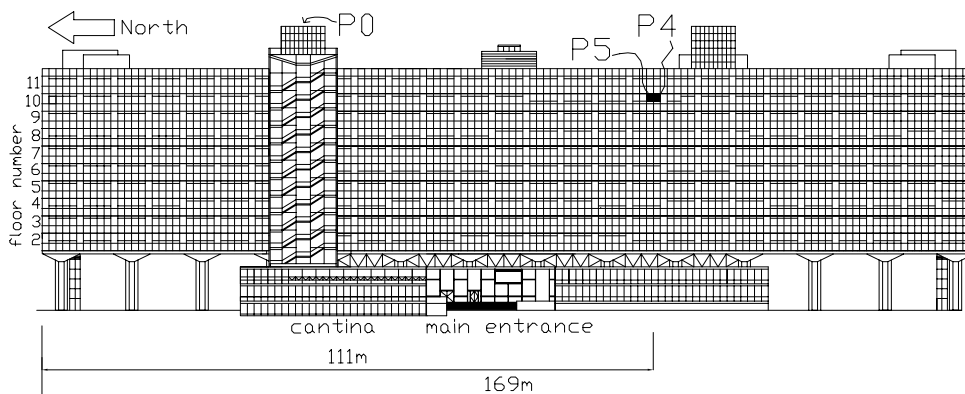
Measurement positions at the west facade of the Main Building of the TUE.
